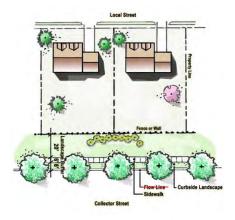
Collector Street Frontage Buffer Measurement Detached Straight Walk
